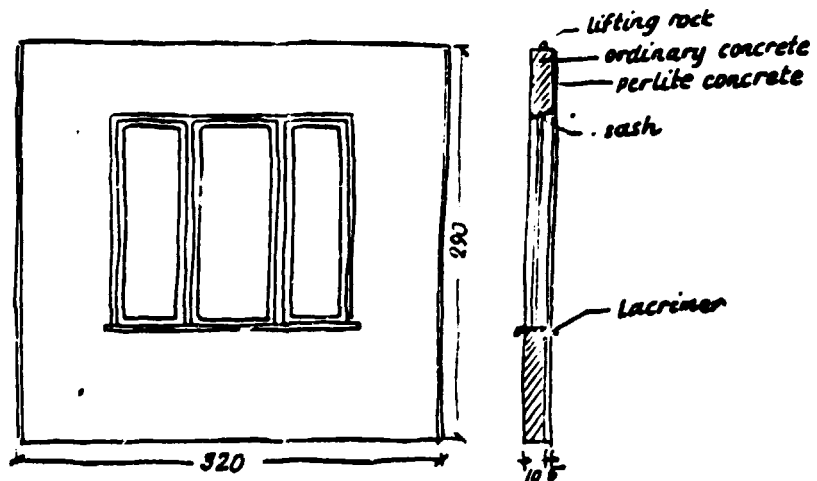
Prefabricated sandwich outer wall slab with ordinary and perlite concrete
